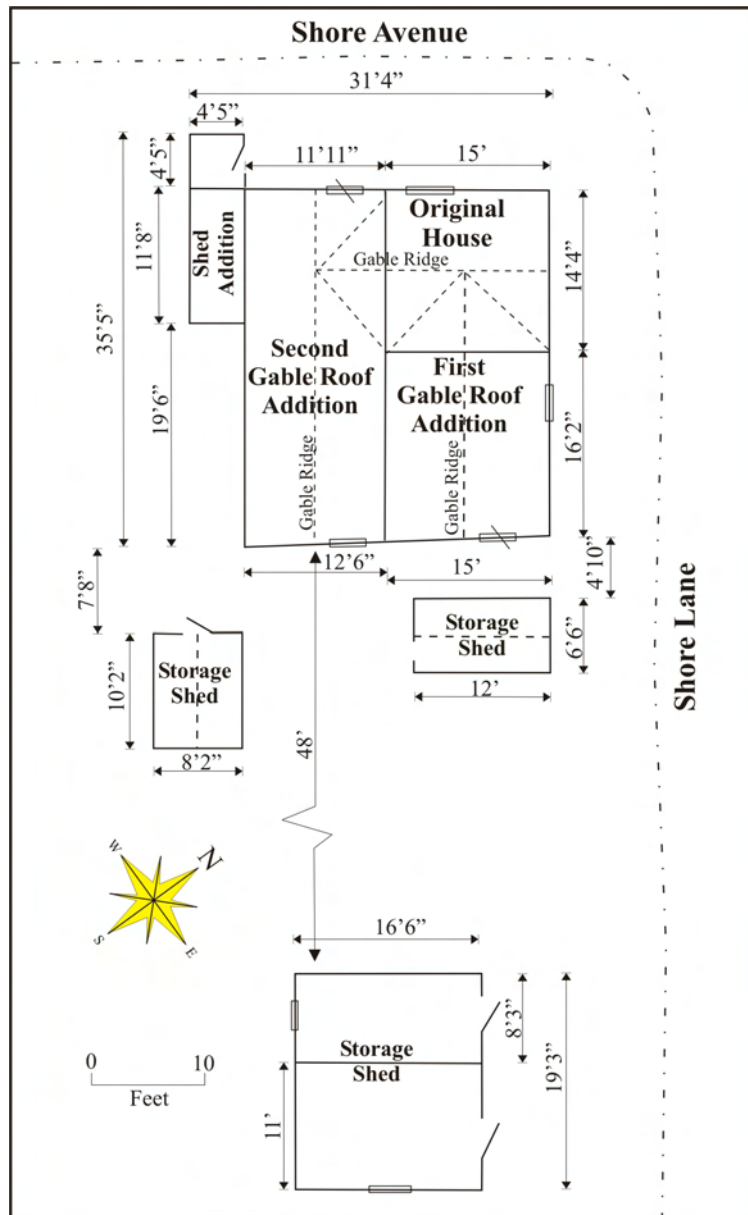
Plan of the Elwood Hunnicutt House at 519 Shore Avenue.
